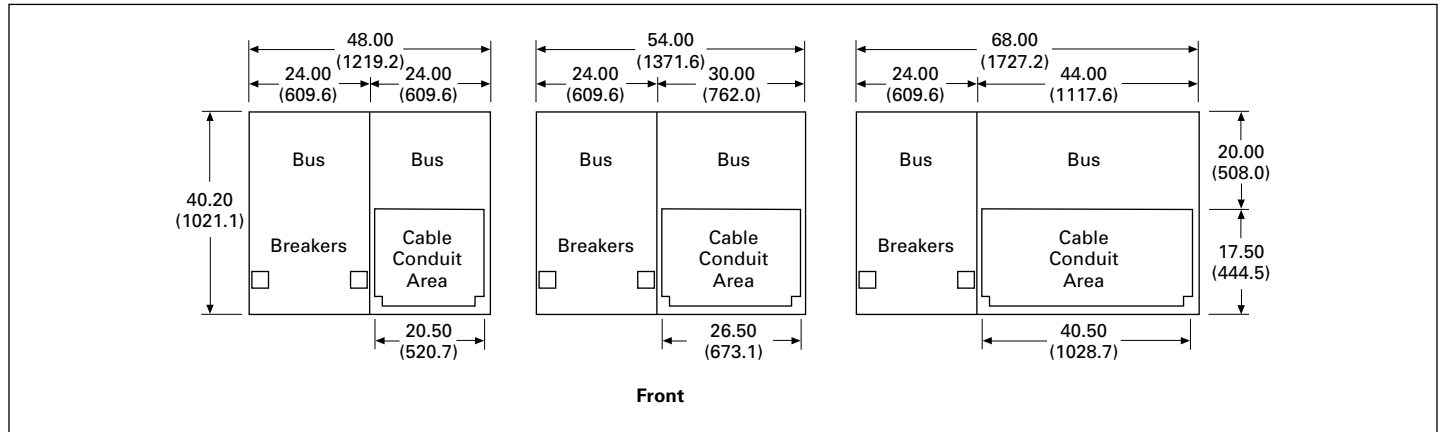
Floor Plans and Available Conduit Space—Front-Access Structures—Dimensions in Inches (mm)
